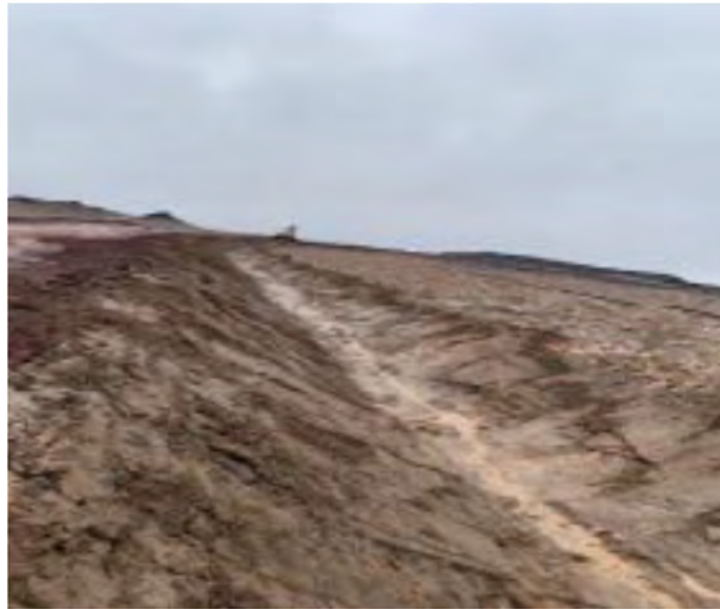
East Ditch boulder removal during construction, August 10, 2021.
